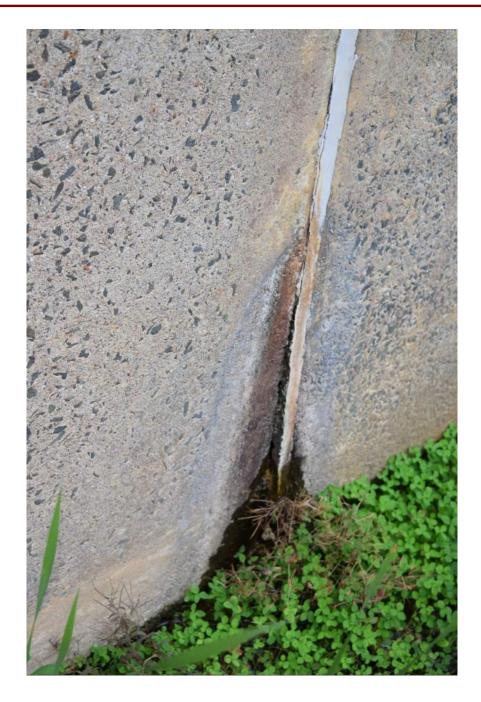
Expansion Joint at North Wall of Basin No. 1
